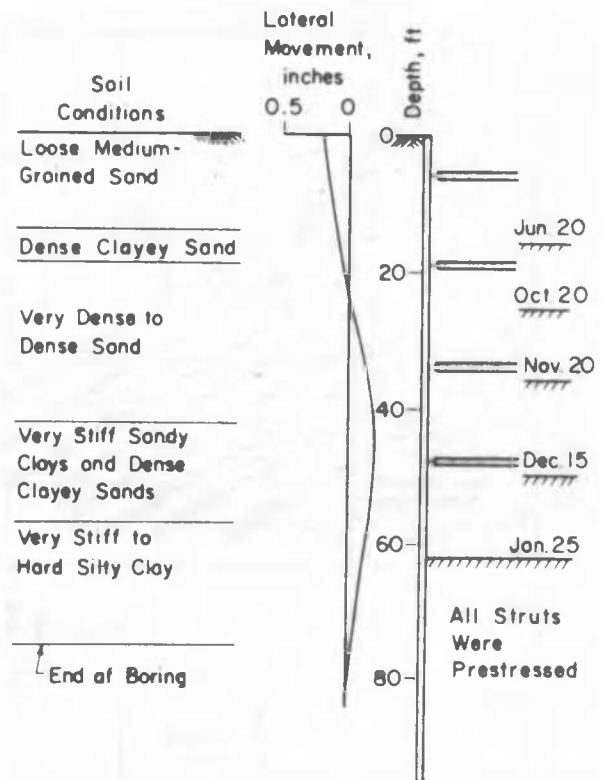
Section through Cut in Dense Cohesive Sands and Stiff Silty or Sandy Clays, Supported by Cross-Lot Bracing, in Oakland, California; Lateral Movement of Soldier-Pile Wall during Excavation
